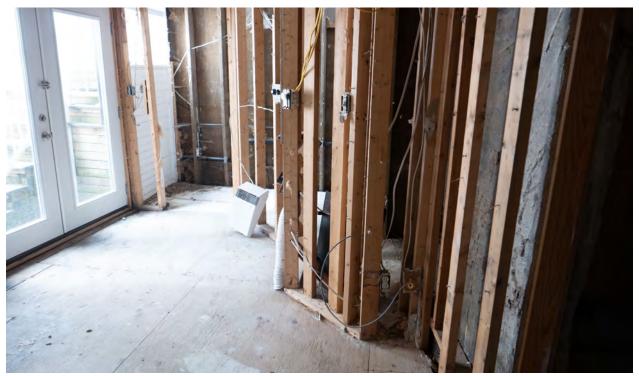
The rear addition in the basement, with plywood subfloor resting directly on grade (CBCollective, 2023).
